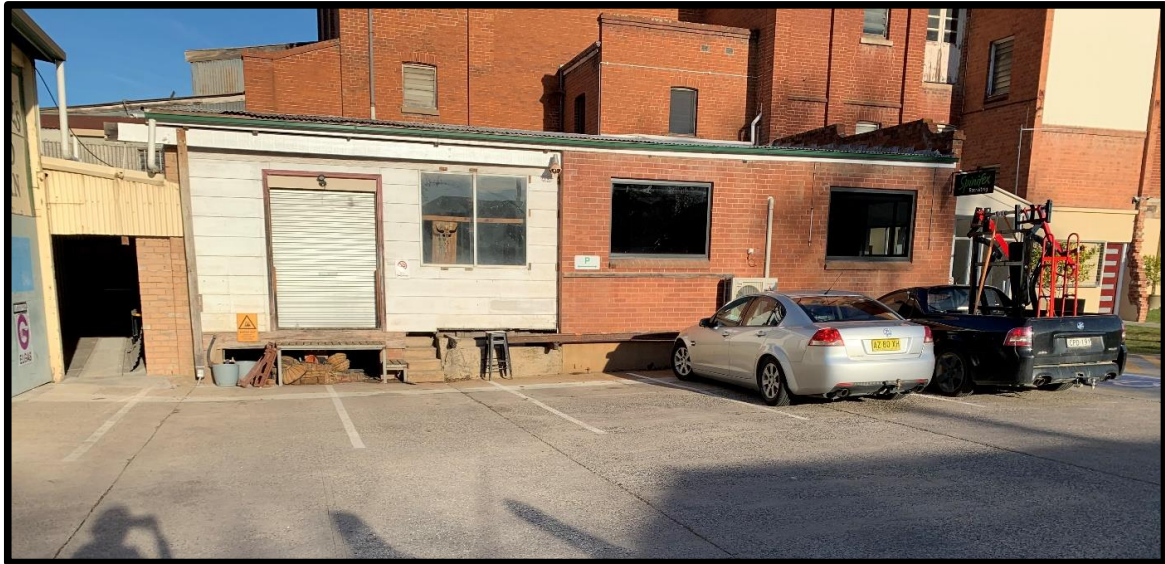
North-Western Elevation of Existing “Spinifex” Office – New Carpark Proposed to Accommodate Carparking from Existing “Spinifex” Office and New Recreation Facility (Gym)
